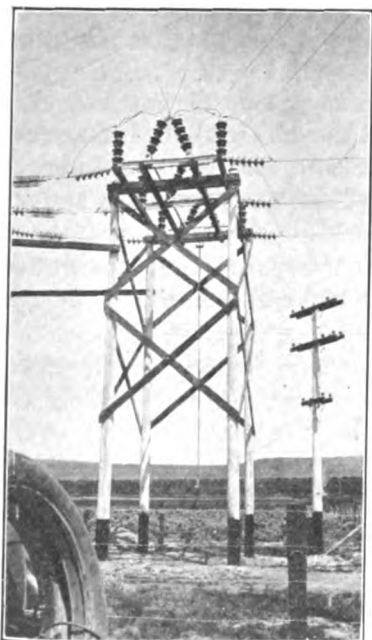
FOUR-POLE STRUCTURE FOR MOUNTING HEAVY TYPE SECTIONALIZING SWITCH
